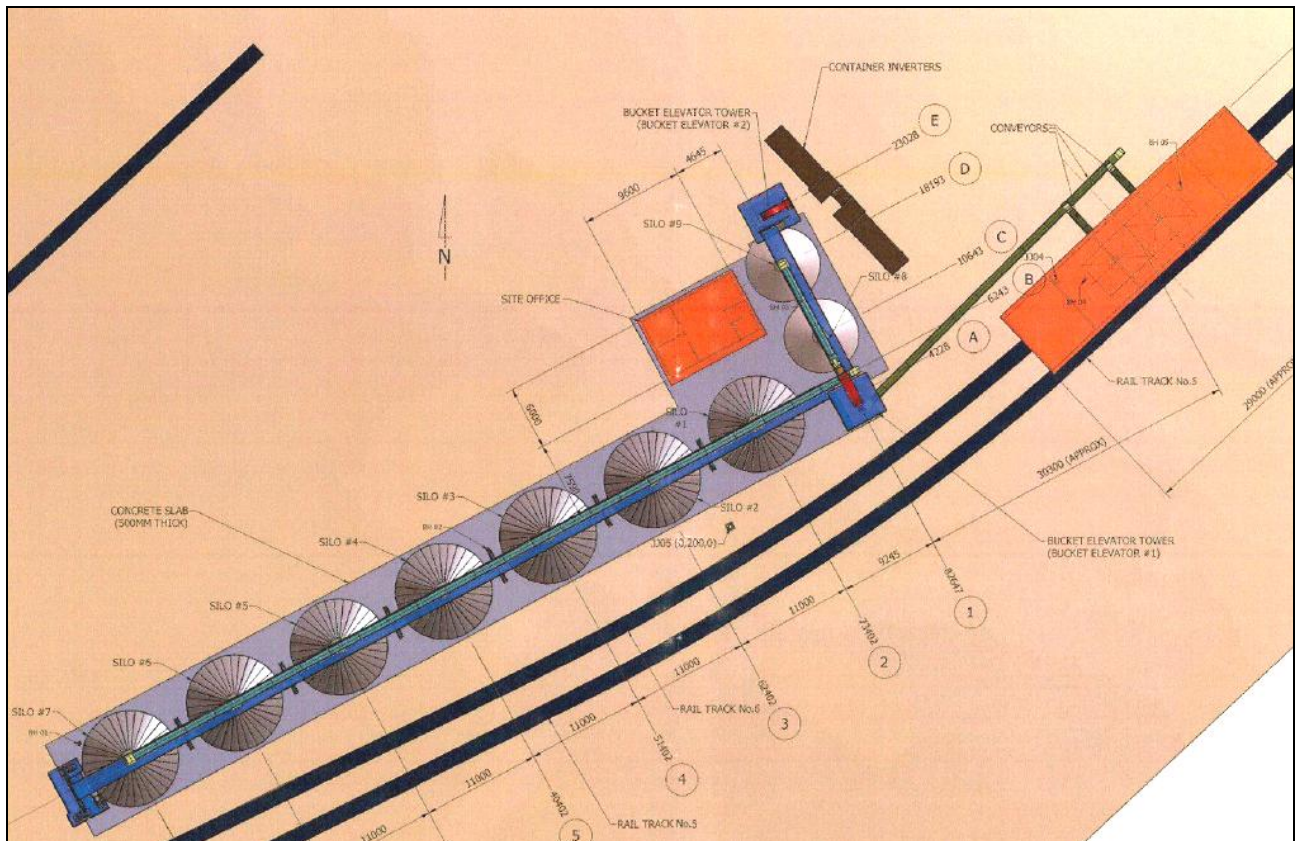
Aerial view of the proposed grain storage and container packing (GSCP) facility
